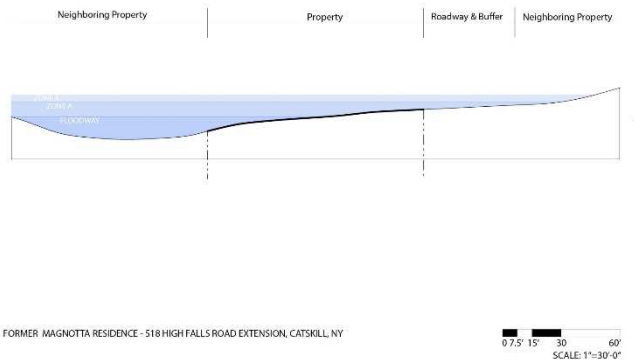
Section view of 518 High Falls Road Extension showing topography and flood zones as well as neighboring properties.
